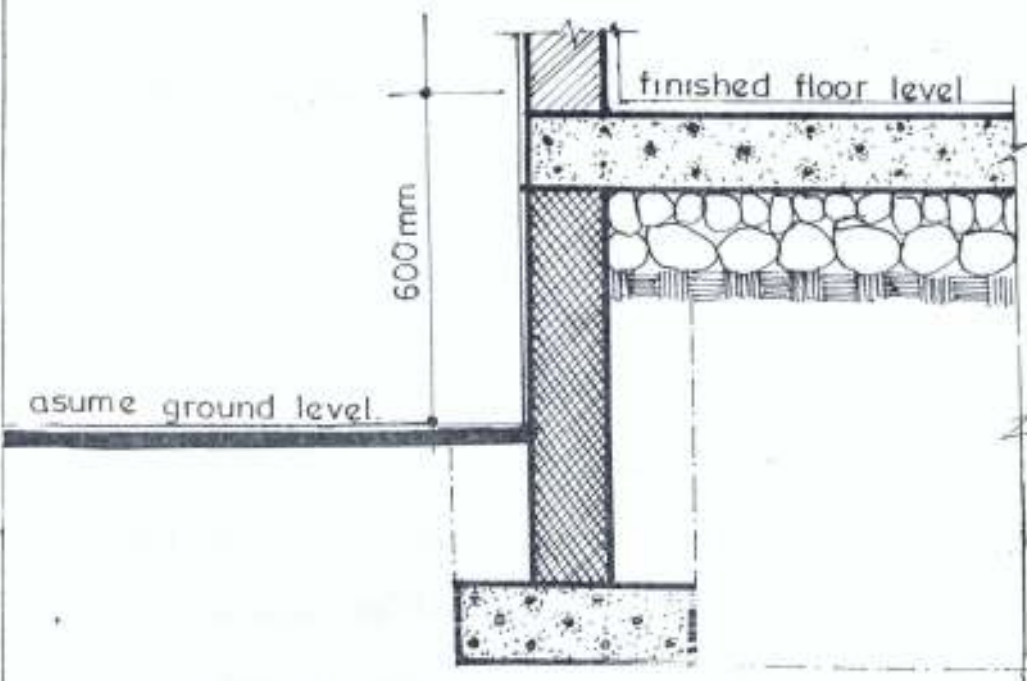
BUILDING FINISHED FLOOR LEVEL
